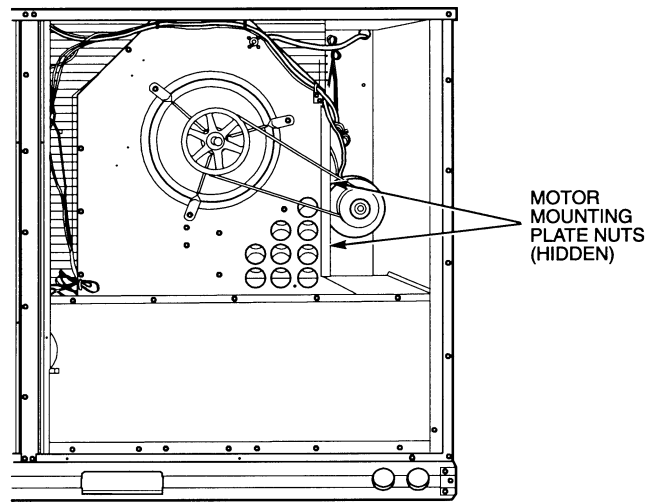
Typical Belt-Drive Motor Mounting for Sizes 102, 150
